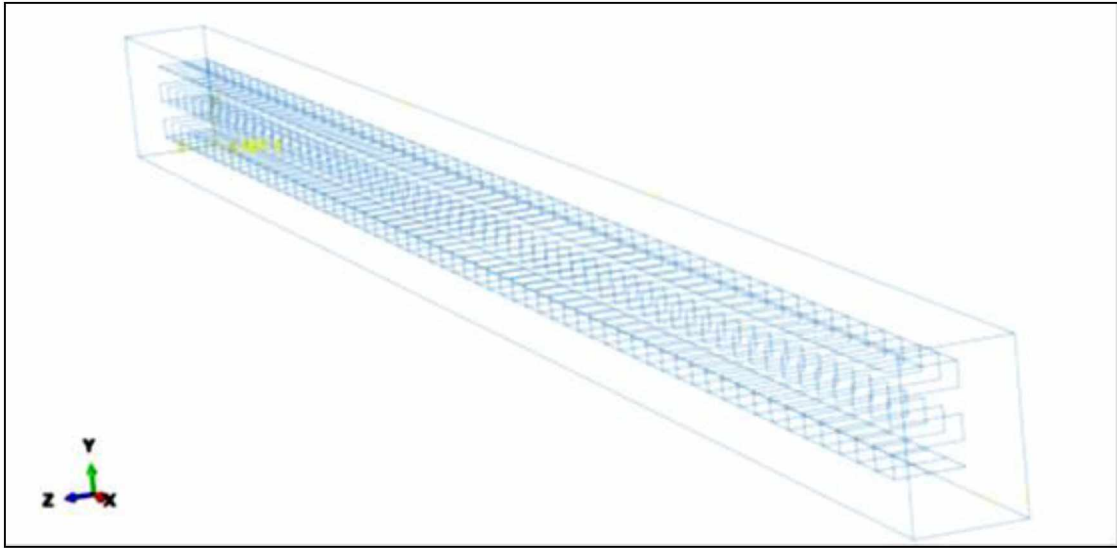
Welded Wire Reinforced B2WWR Beam
